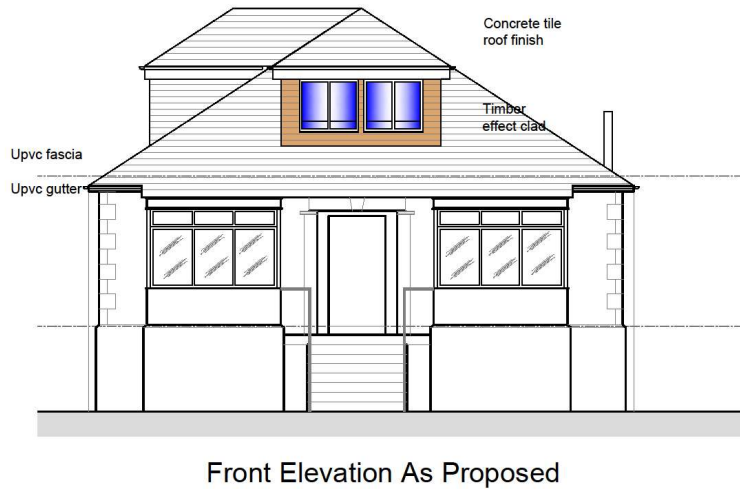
Proposed Front Elevation 7 Gilmourton Crescent
